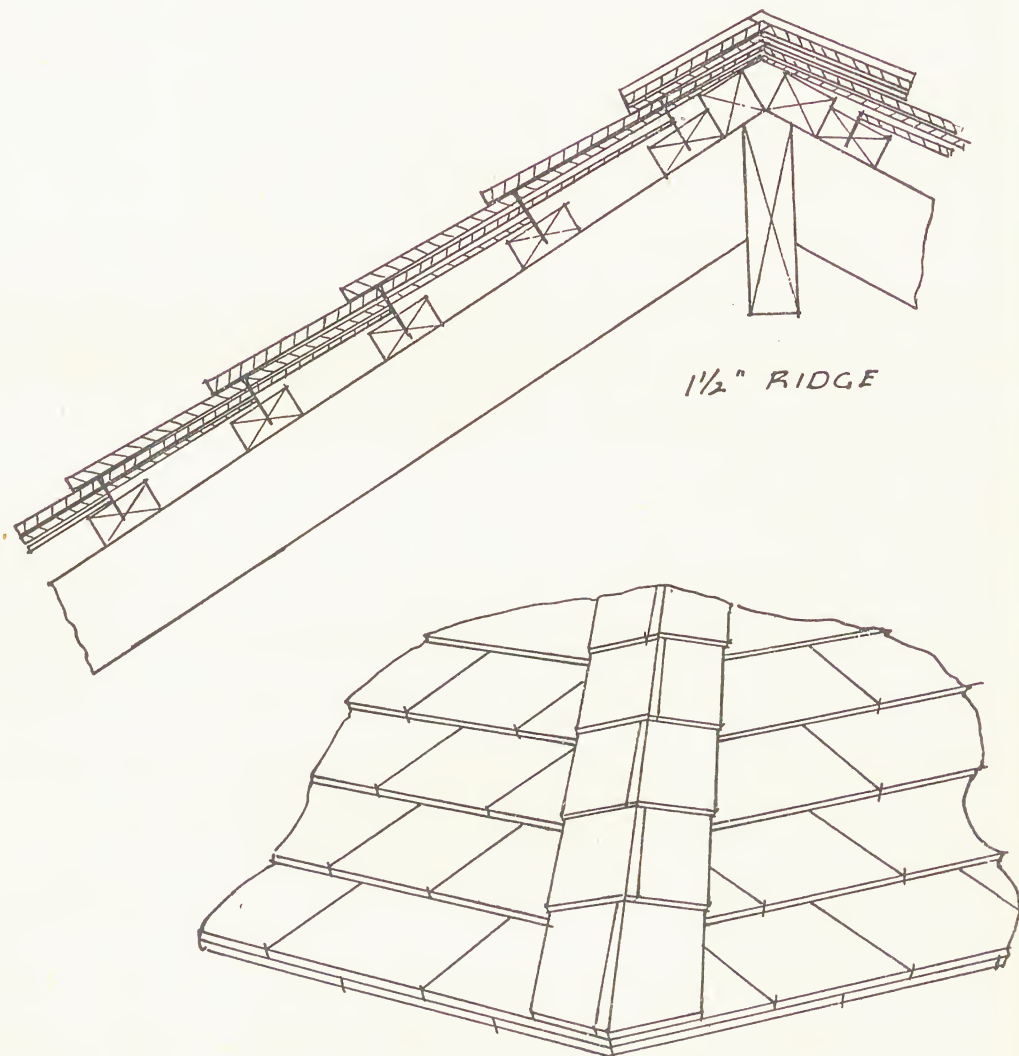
Shingles—detail of roof at 30° pitch with 16-inch shingles.
